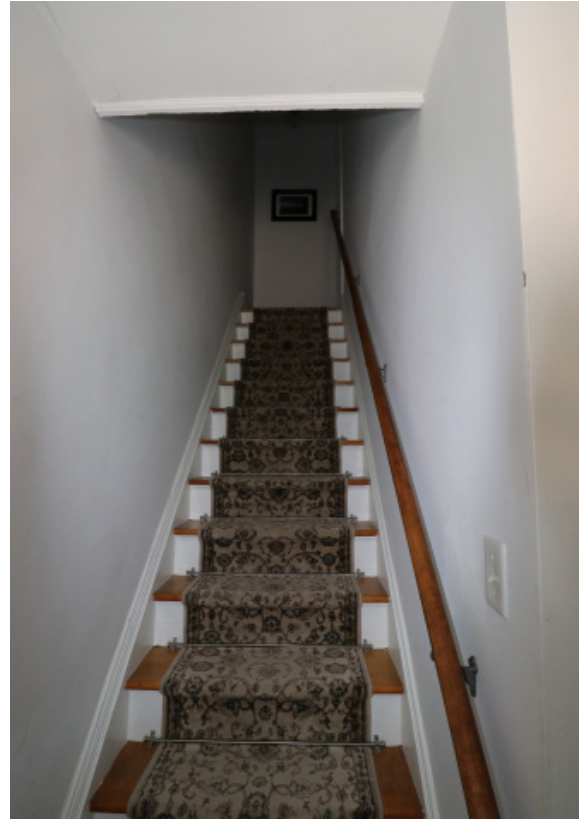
D-129 Upper section of the stairway leading to the second floor apartment.
